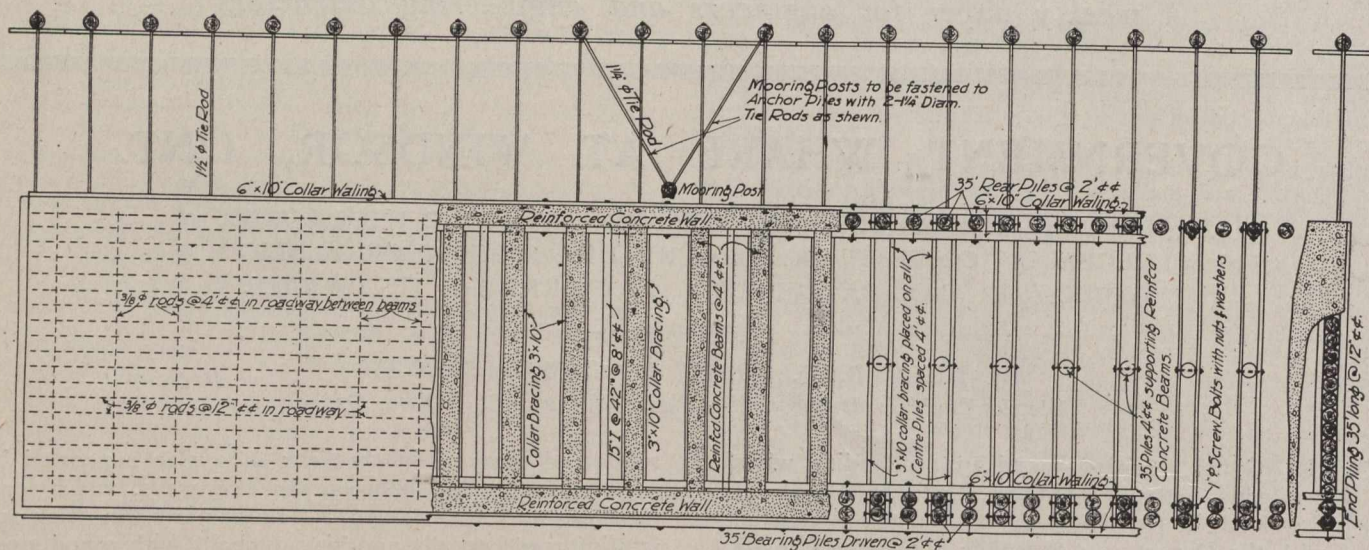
Plan of Roadway Reinforcing, Beams, Piling, Collar Waling and Bracing.
